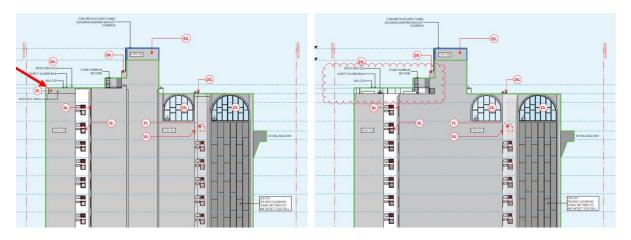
Left: north elevation plan extract, as lodged with the subject application Right: as amended during assessment. A proposed acoustic screen has been deleted (red arrow).
